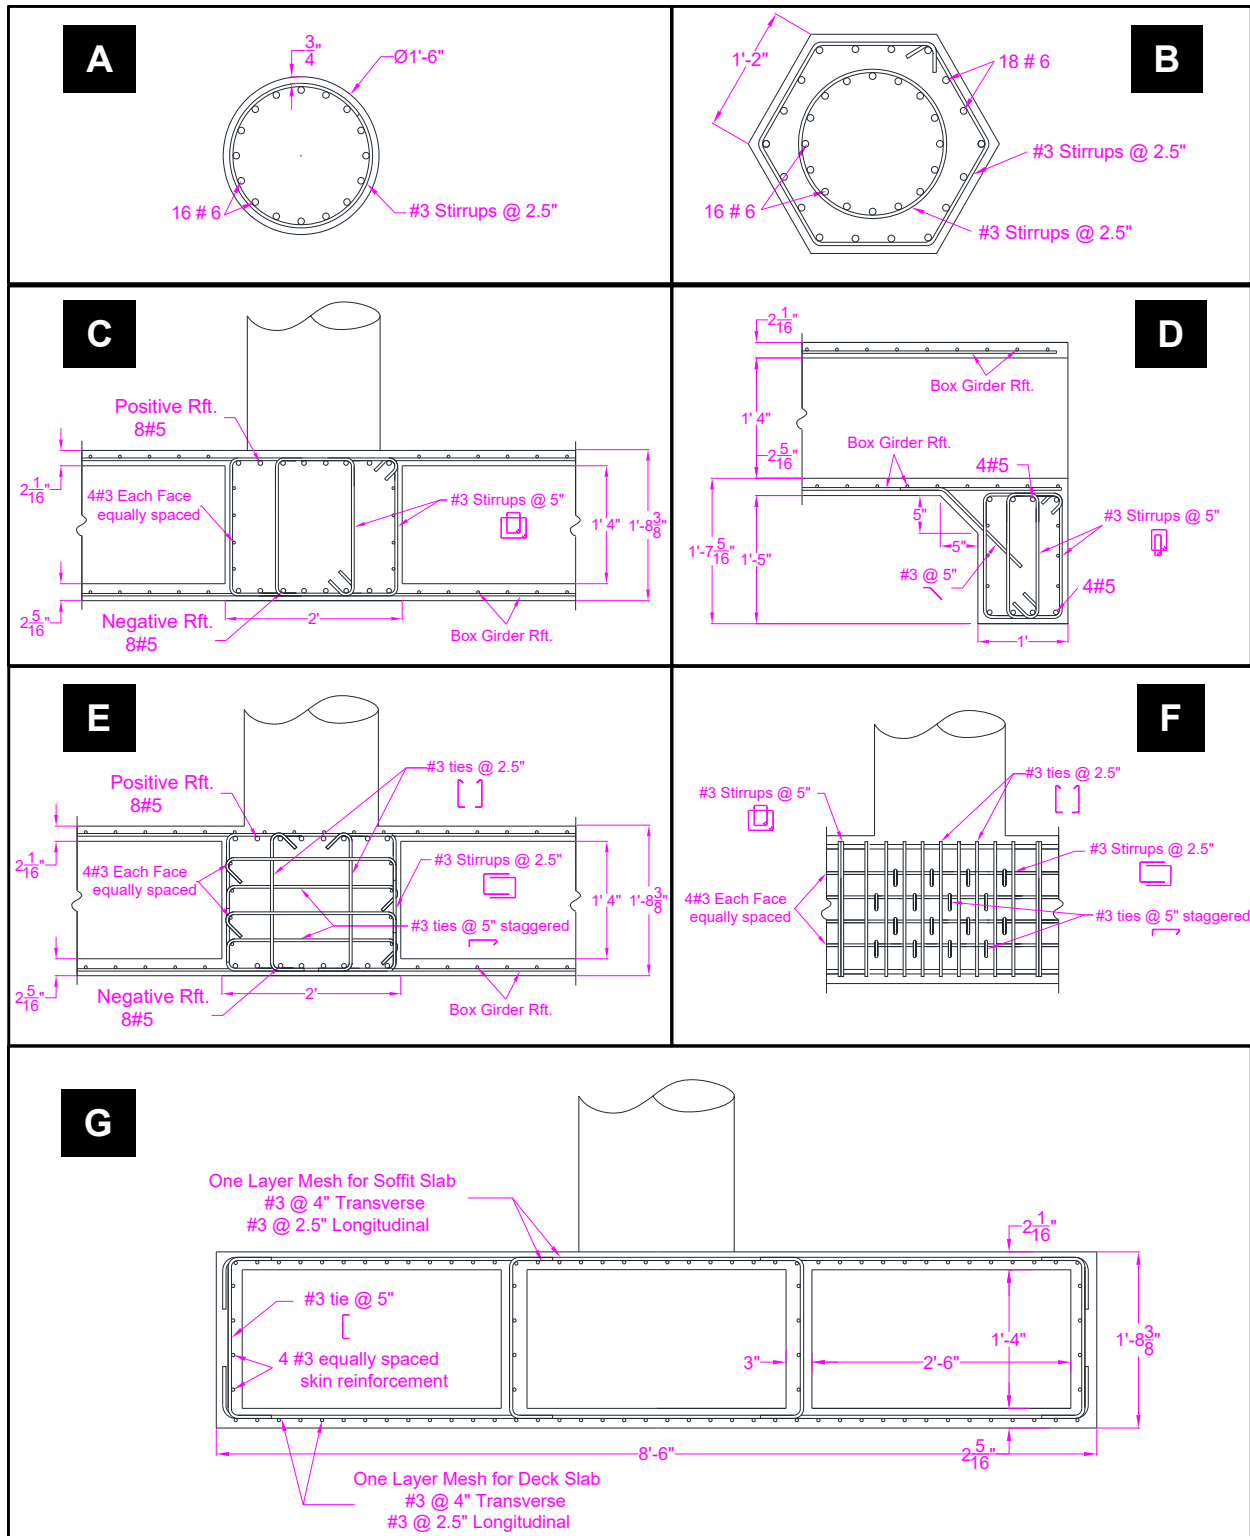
Dimensions and reinforcement details for each of the specimen components: (A) column, (B) column head, (C) cap beam, (D) seat boundary beam, (E) joint reinforcement in transverse direction, (F) joint reinforcement in longitudinal direction, and (G) box-girder.
